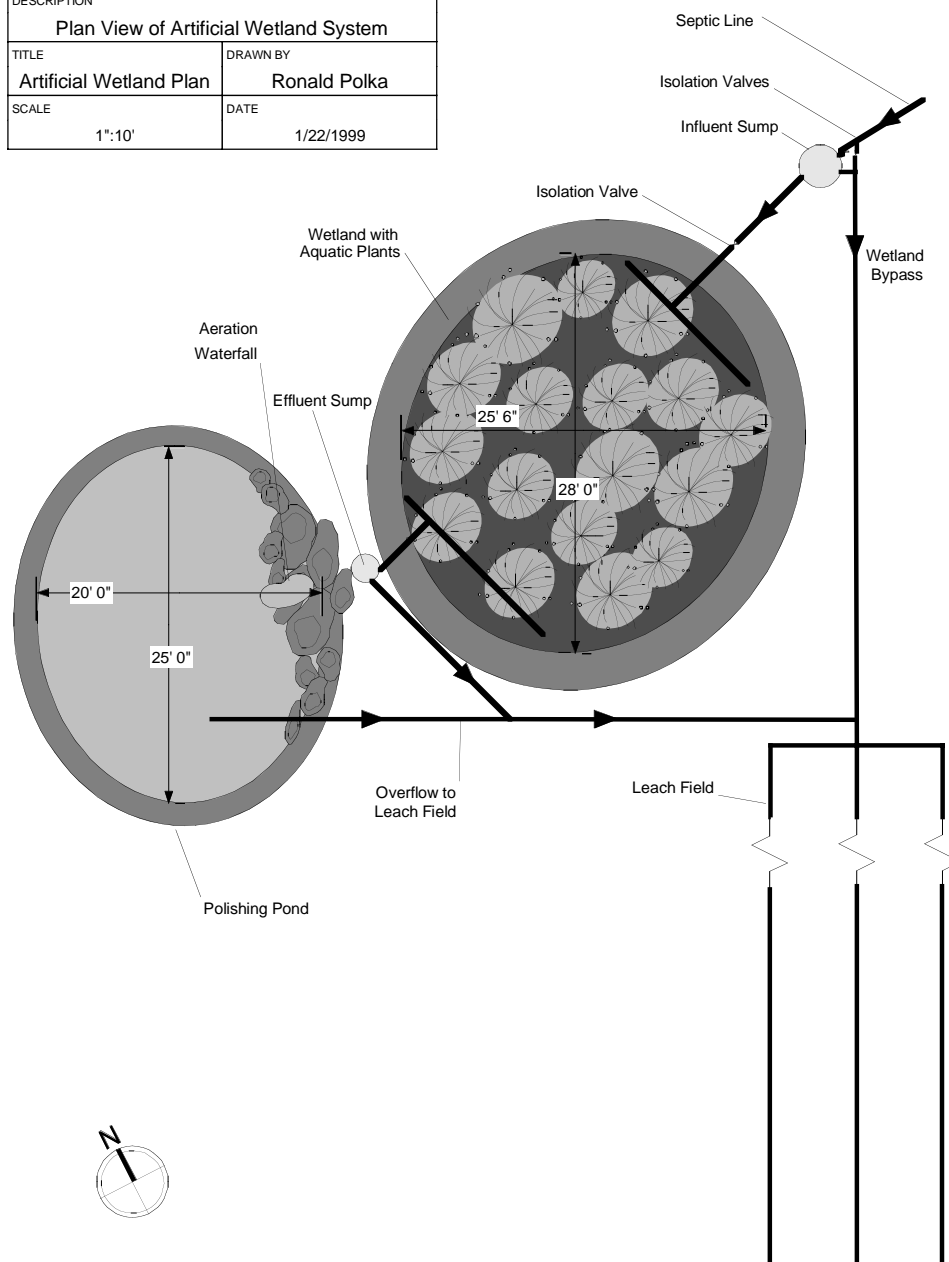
Subsurface Flow Constructed Wetlands System Plan View.
